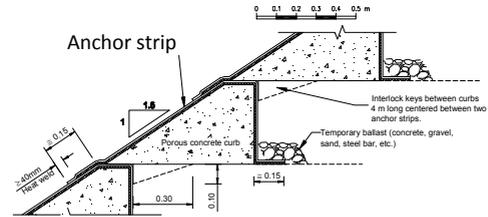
Extruded concrete curbs with one geomembrane anchor wing per curb.
